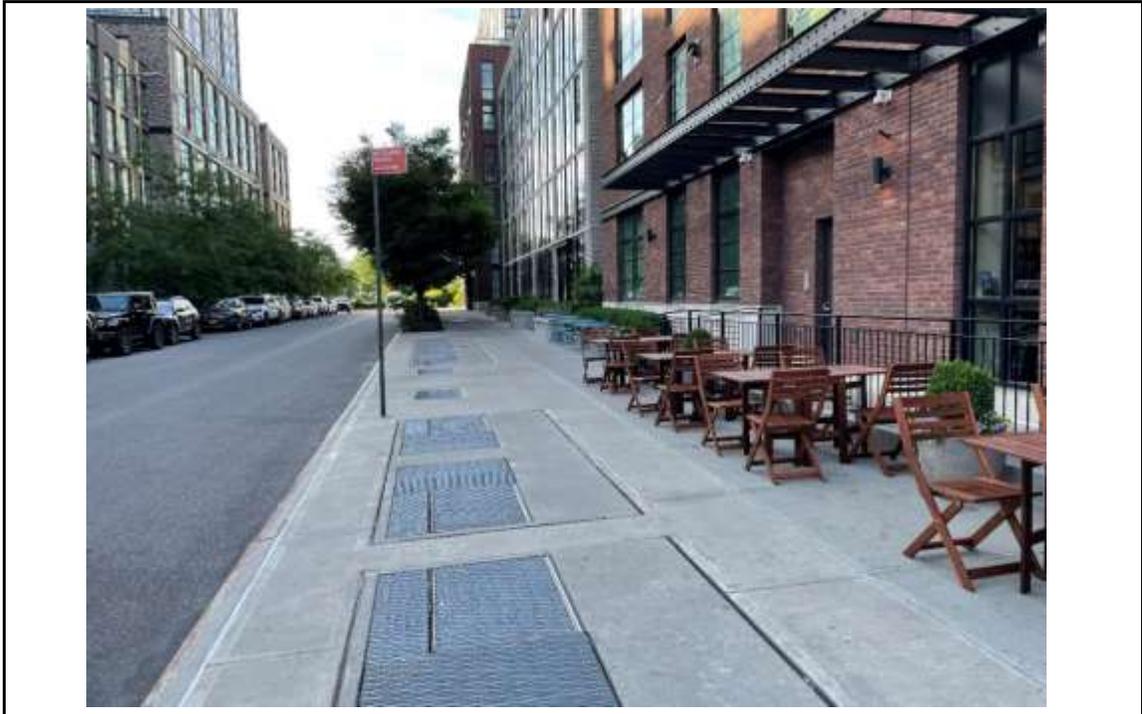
1st Street sidewalk, facing southeast. 20 June 2022.
